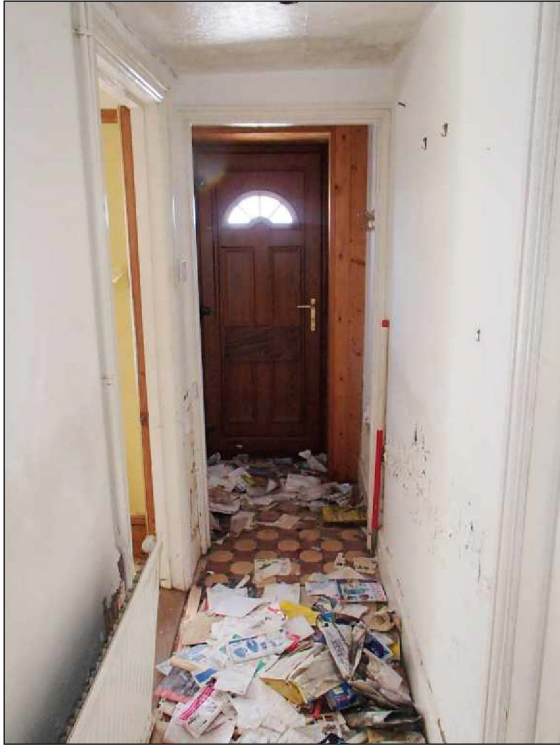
Entrance hall of Stoke Cottage, looking east-southeast. (1m scale)
